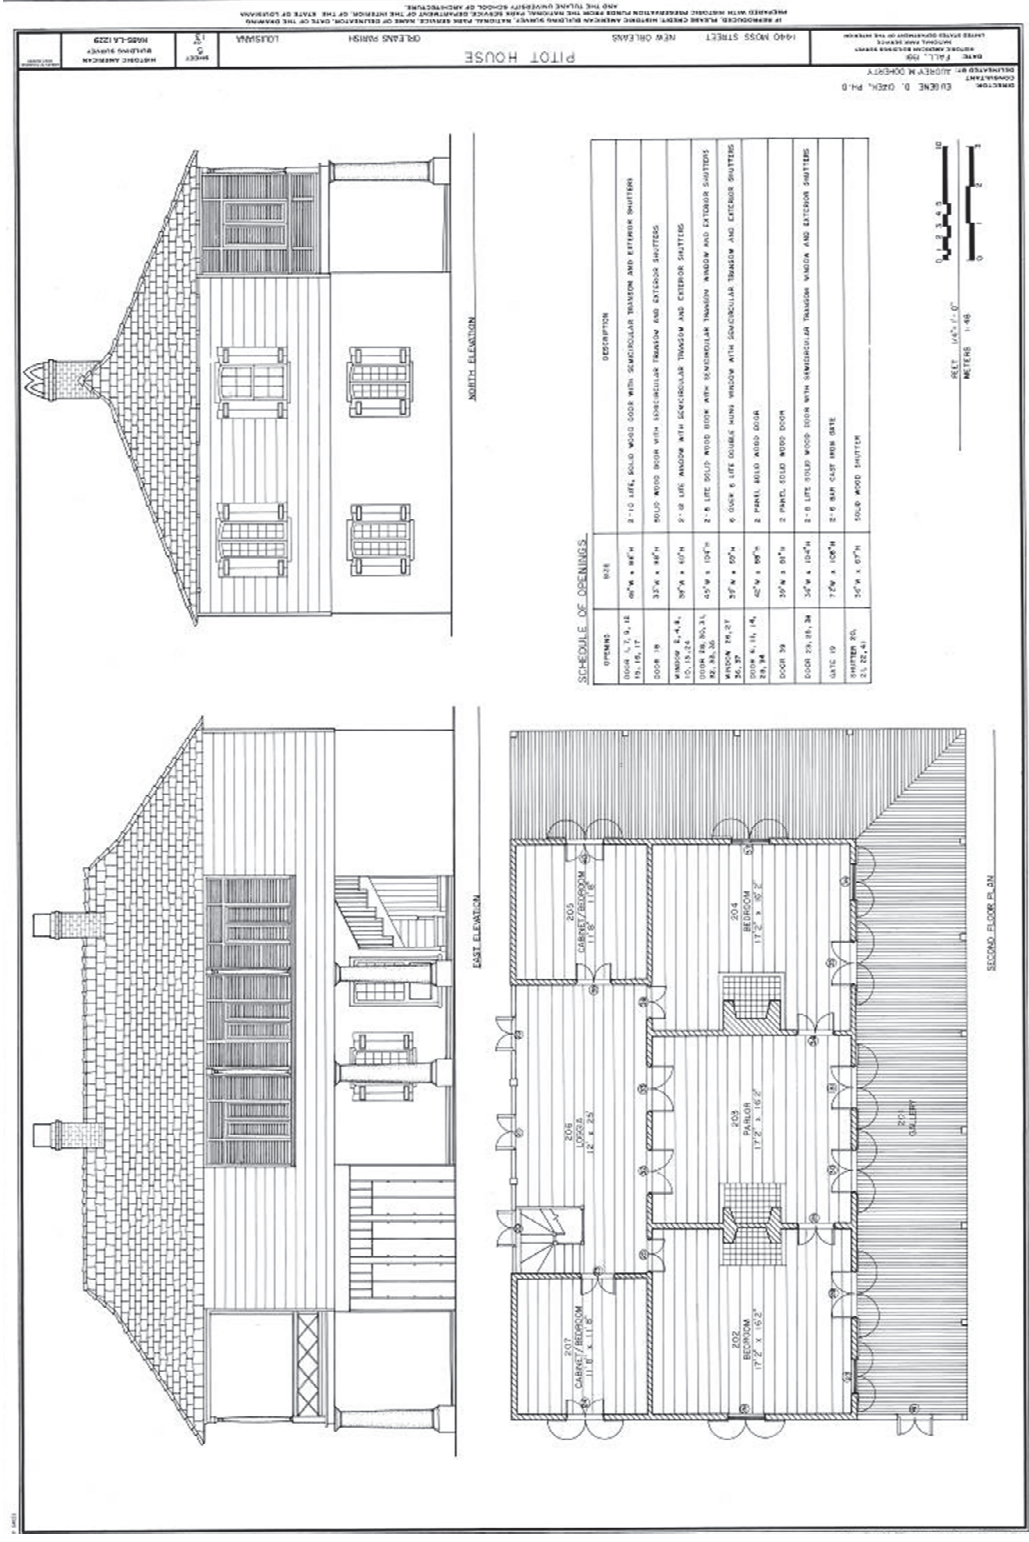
Second Floor Plan, East and North Elevations. Source HABS.
